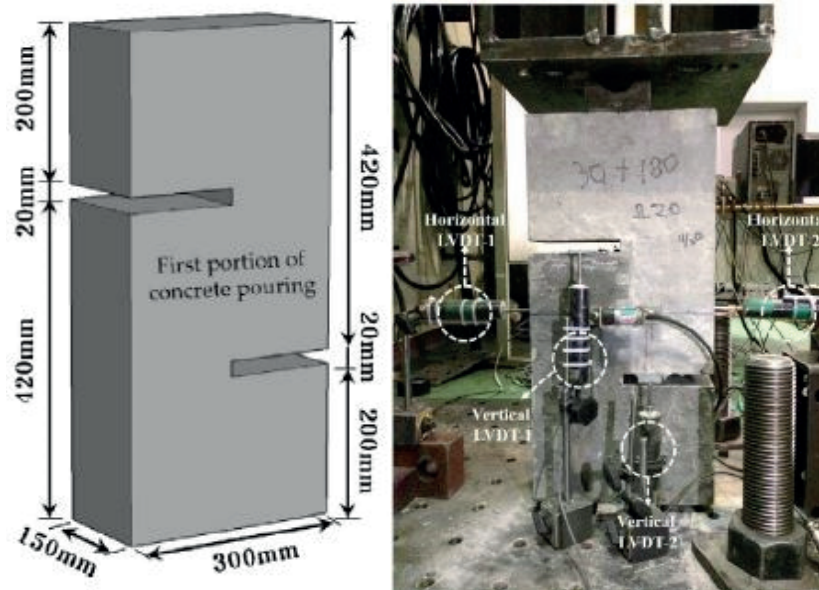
Monolithic L-Shape UHPC Specimen Test Setup and Specimen Dimensions
